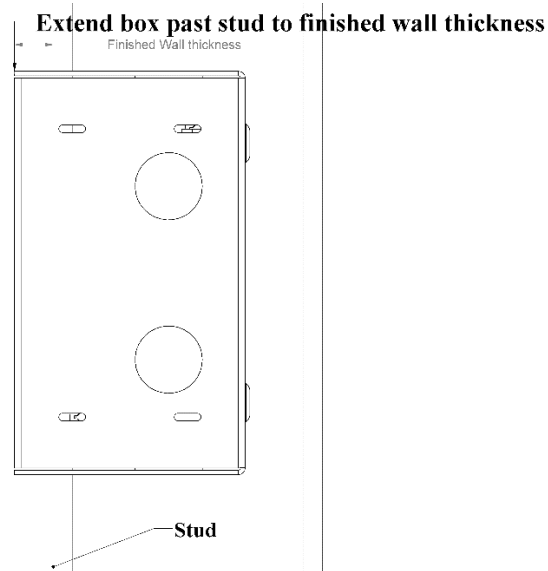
Flush Mount Installation (Protrude to finished wall thickness)
